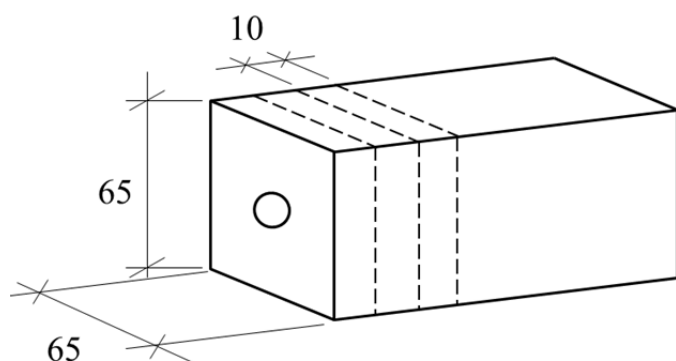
Small-scale concrete specimens cut out from rectangular concrete blocks.
